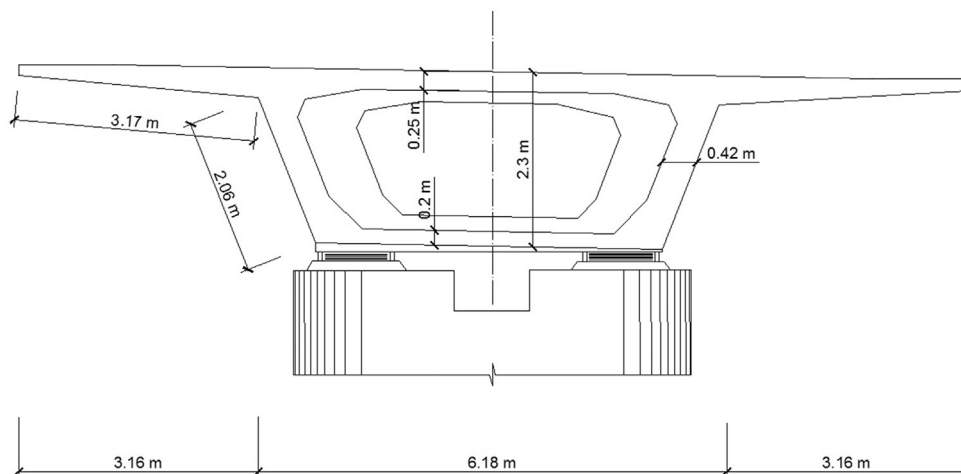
Cross section of the Arosa's concrete bridge deck.
